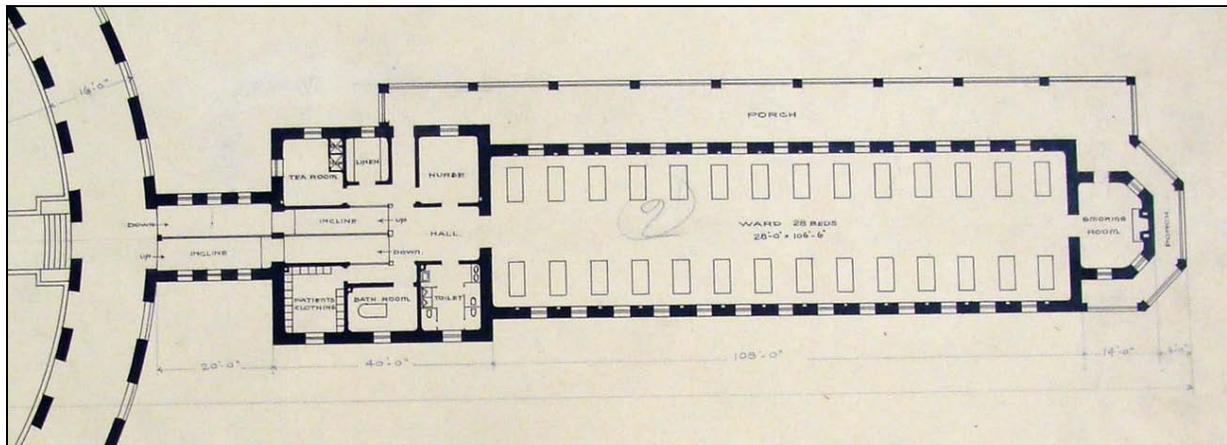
Excerpt of "Proposed Battle Mountain Sanitarium First Floor Plan"
